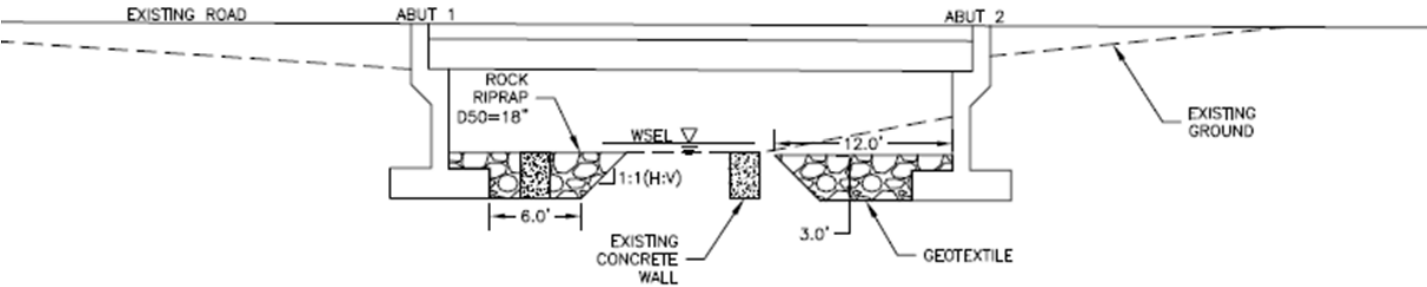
Cross-sectional view of Bridge A-24-M with recommended hydraulic scour countermeasures
